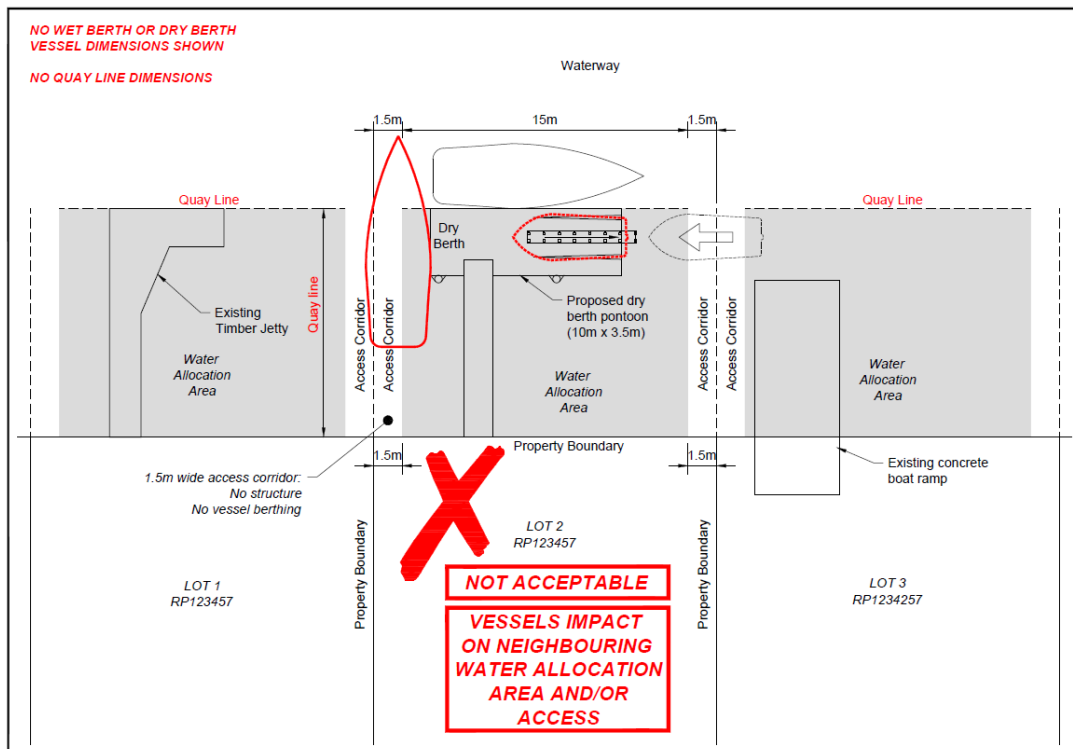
Example of unacceptable site and layout plan and water allocation area plan
